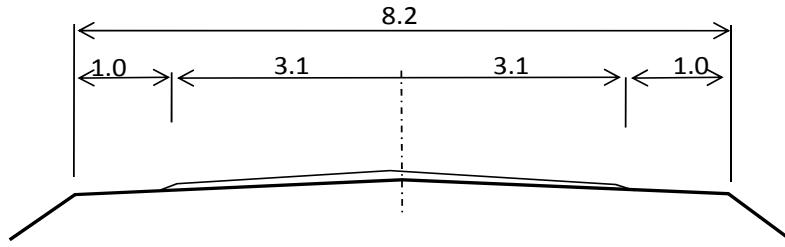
Road Width on National Highway No. 15 (RDA Standard)
